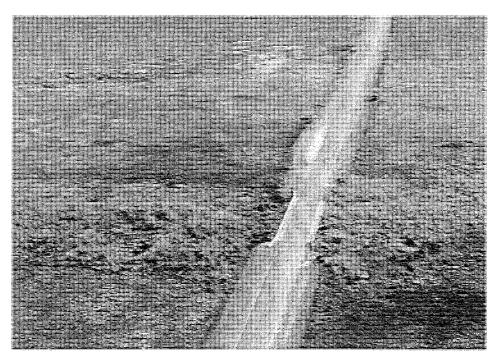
LOOKING EASTERLY AT TAYLOR SLOUGH, WITH STATE ROAD 9336 (FORMERLY SR 27) AND SHALLOW BOX CULVERT TYPE BRIDGE, 60 FEET LONG.
